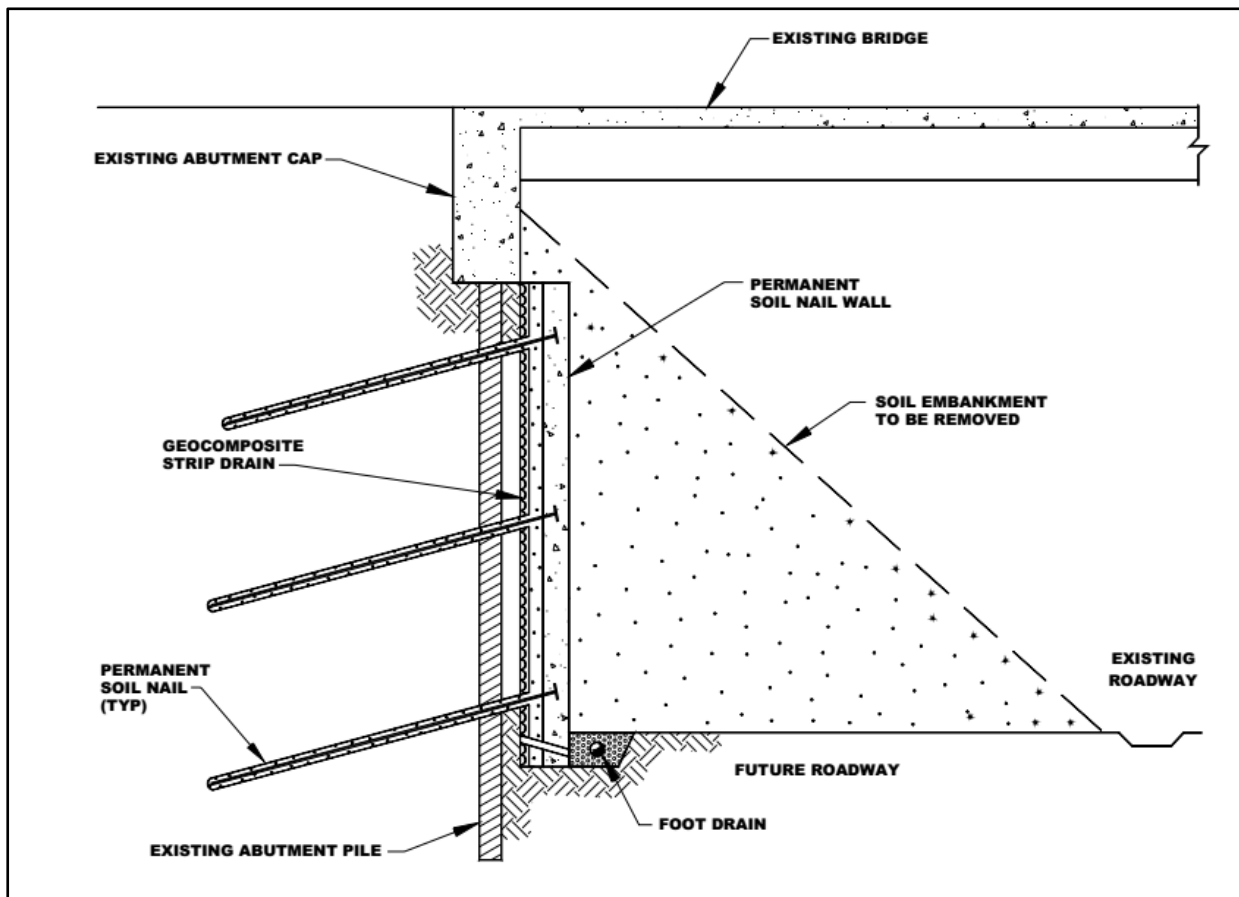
Road Widening Under Existing Bridge. (Lazarte, 2003)
